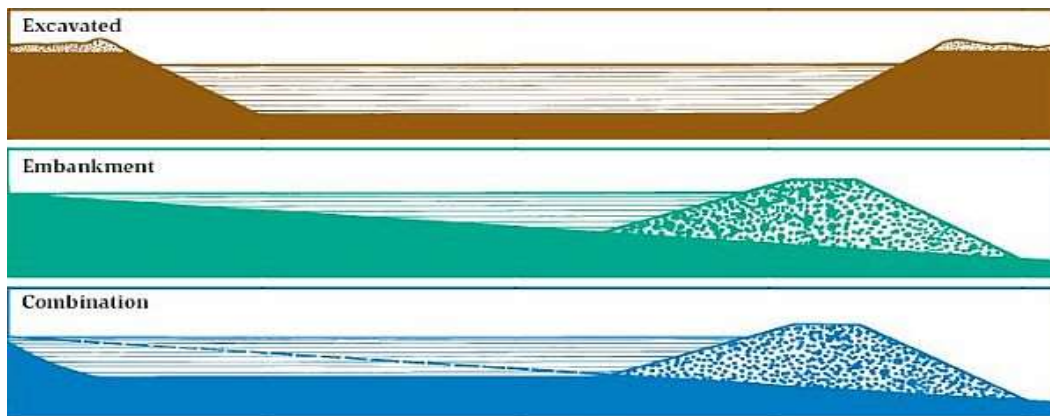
Types of farm ponds: Excavated type (dugout), Embankment type and Dugout-cum-embankment type (combination).
